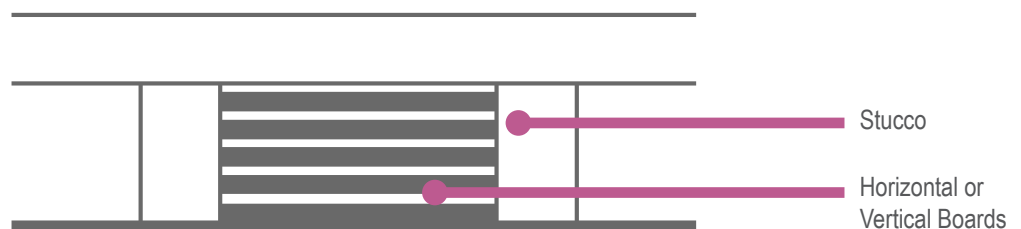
Example of stucco piers with horizontal wood boards in between type foundation.
